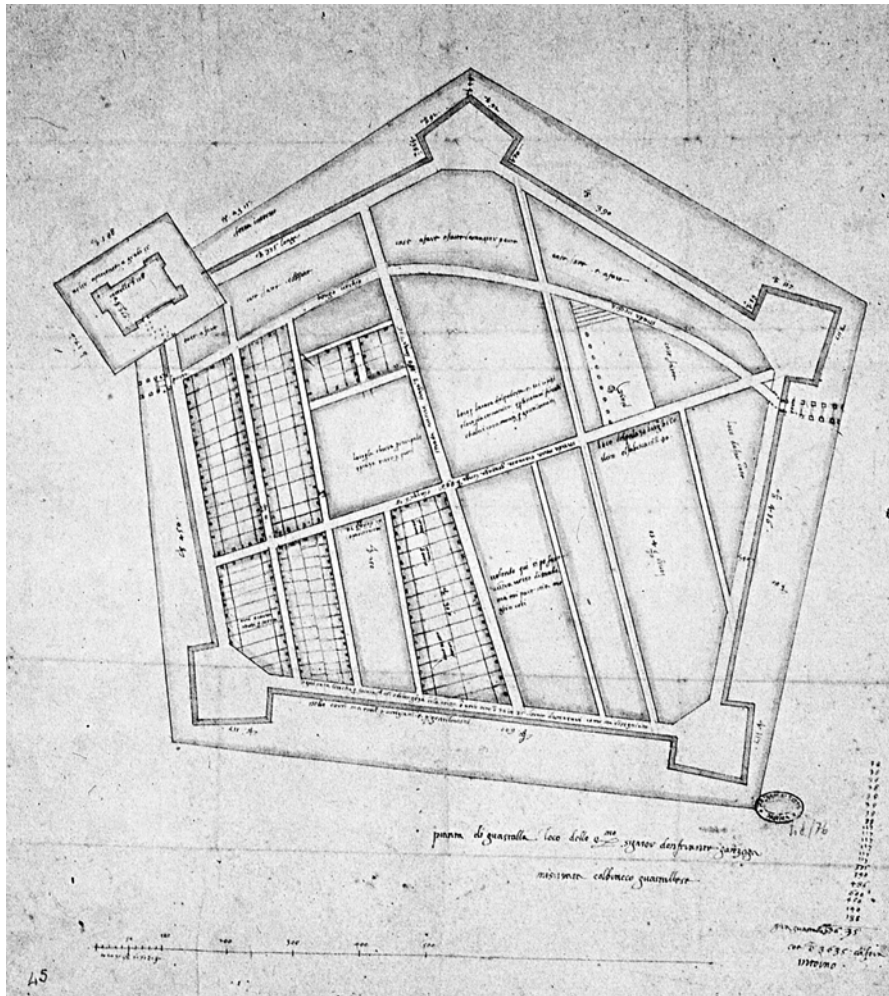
Domenico Giunti, plan of Guastalla, 1553 (Archivio di Stato di Parma, Raccolta mappa e disegni, volume 48, plan 76)
